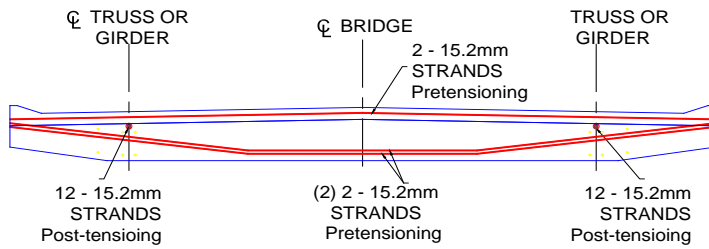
Deck Truss and Plated Girder Deck Panel Pre-tensioning profile
